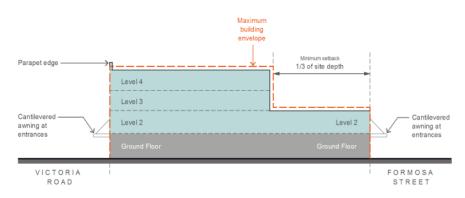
Victoria Road Drummoyne Area C - Maximum Building Envelope Section
